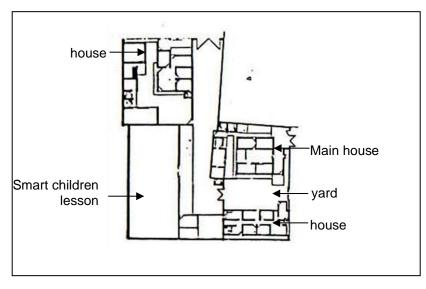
One of the Plans of the Kilungan House Now (Source: Field Observation, 2022)
